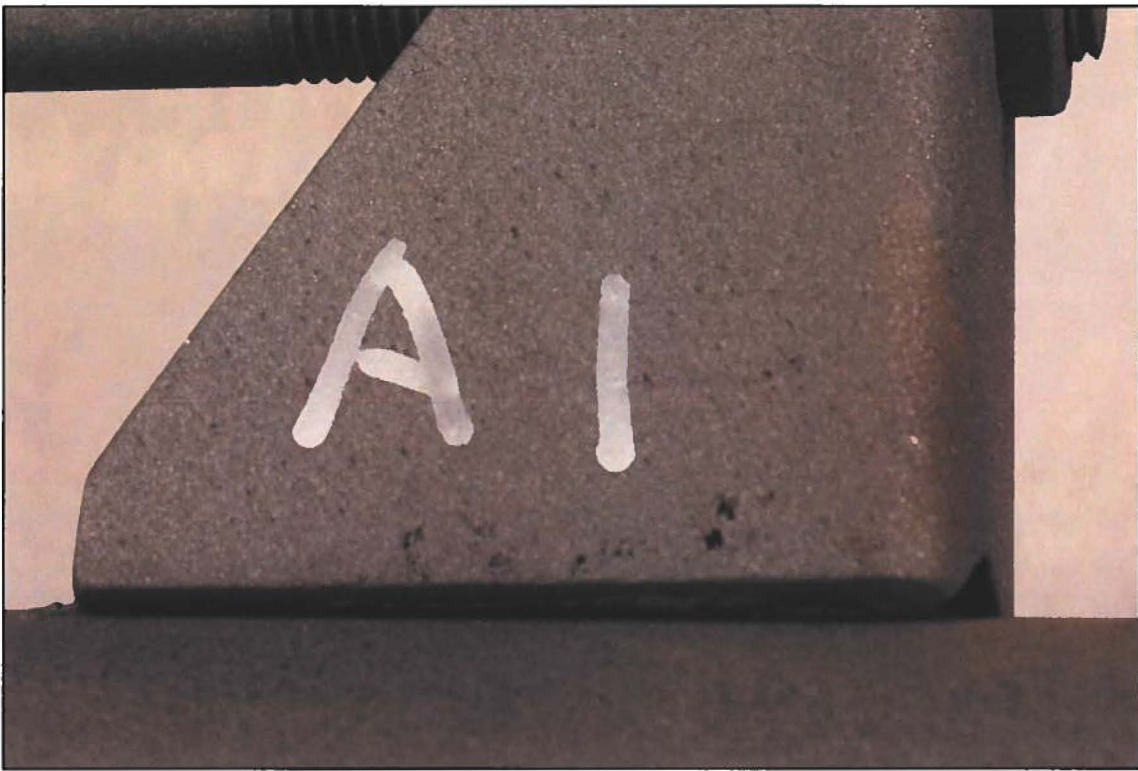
The exterior bottom location of Lug A1 was not welded.
